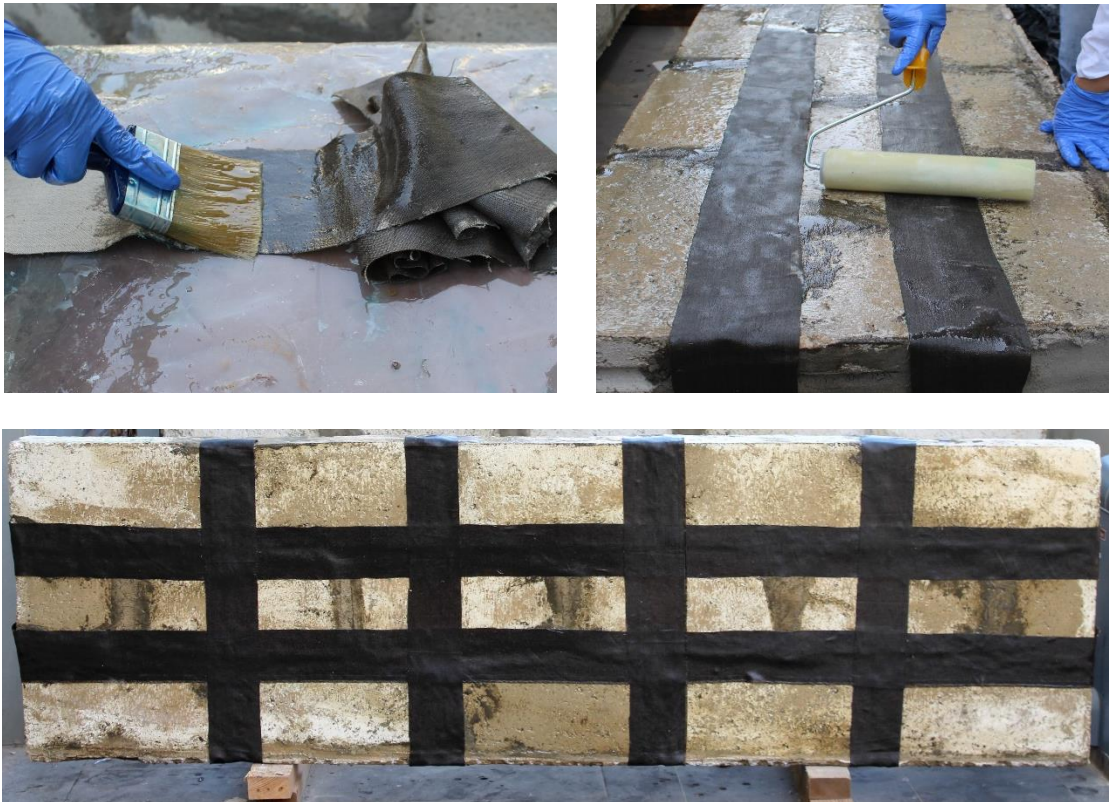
Application of Hemp Fabric to Masonry Wall (Series HS).
